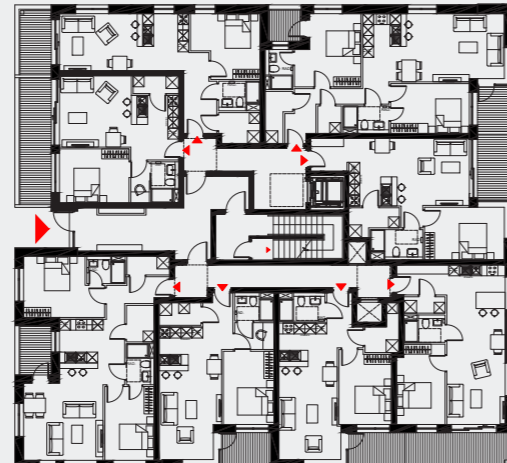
IMAGES : Permitted and proposed Ground Floor Plans for Blocks C, D and E - Not to Scale
